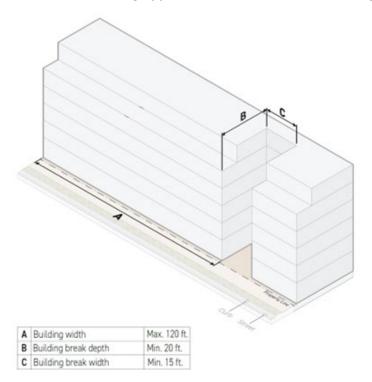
C.2 Reducing Apparent Mass and Bulk with Building Break
